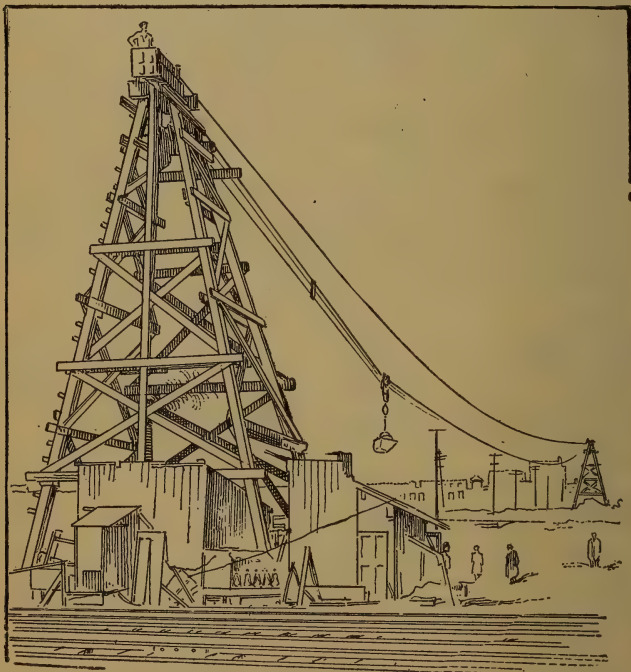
10-Ton Cableway; 800-ft. span with 50-ft. Four-Post Towers.
